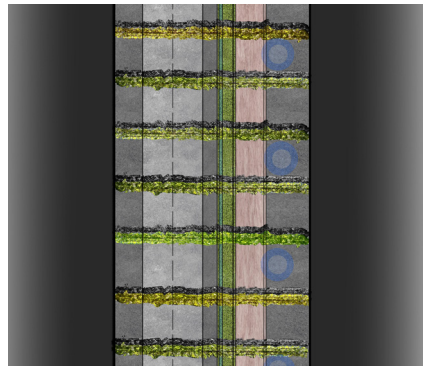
Plan of the Heat Prevention Measures on Prinzenstraße, Area A (Masterplan) (own depiction)
